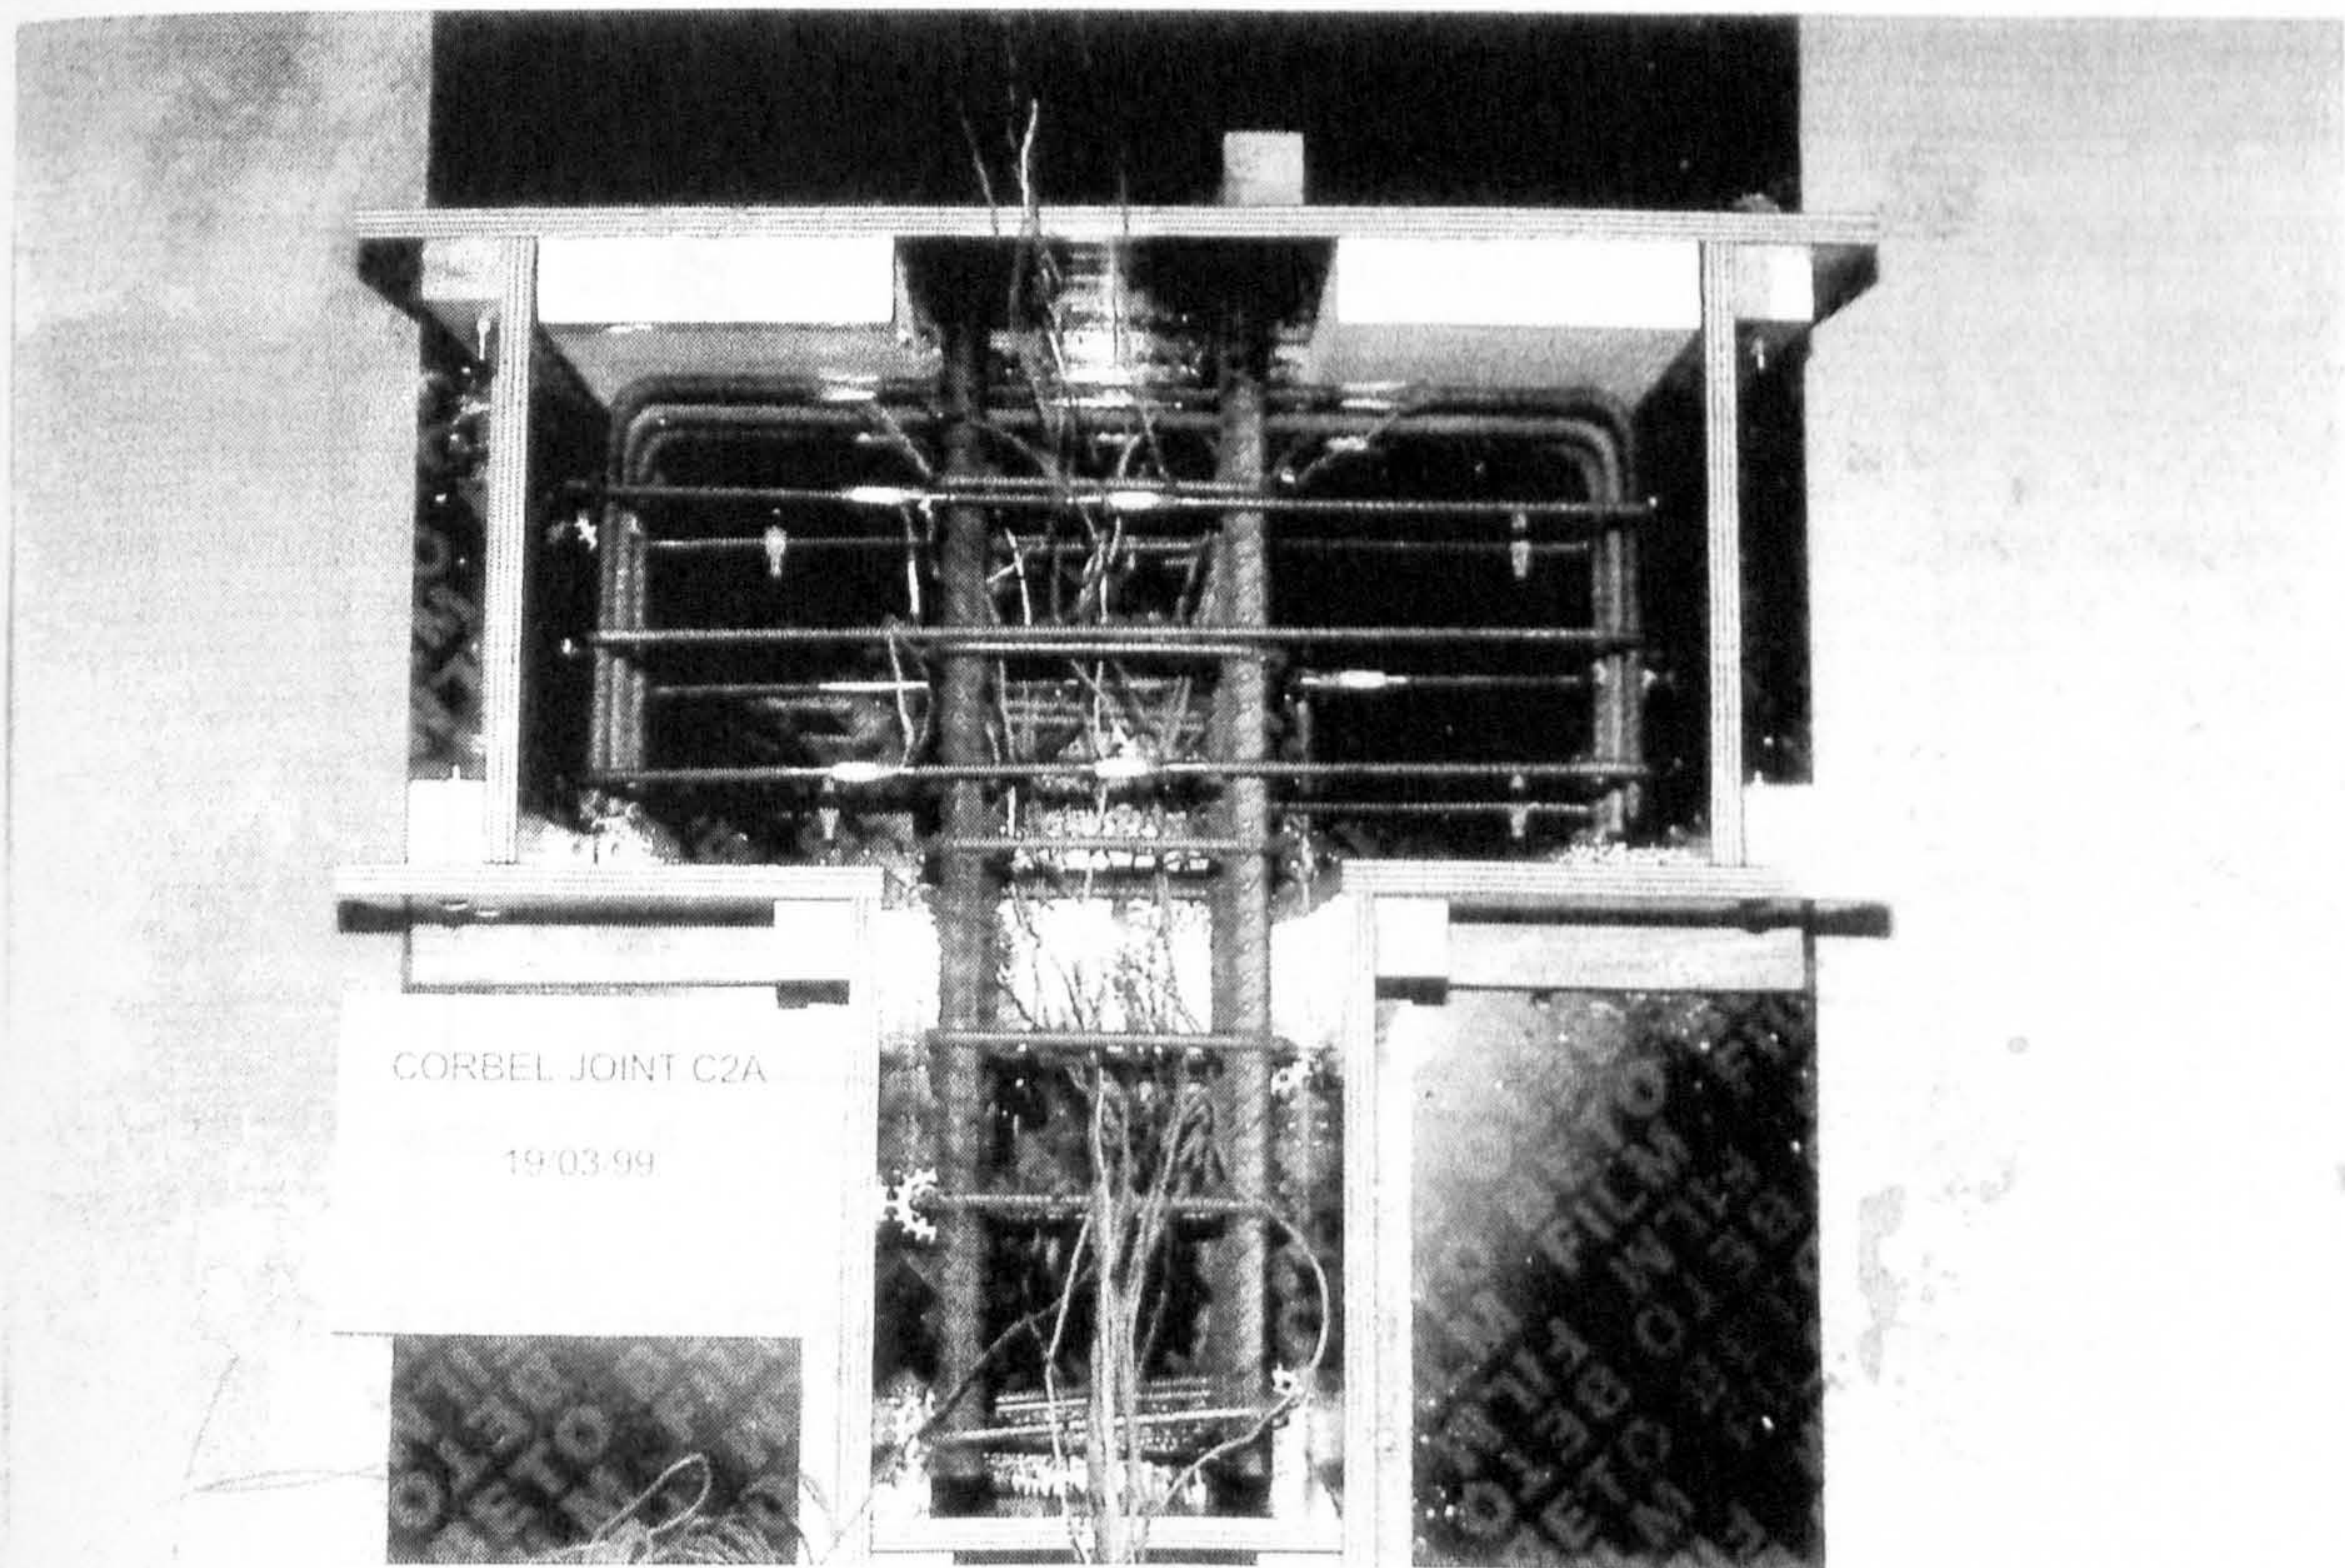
(d) Corbel C2A: Reinforcement & Formwork
